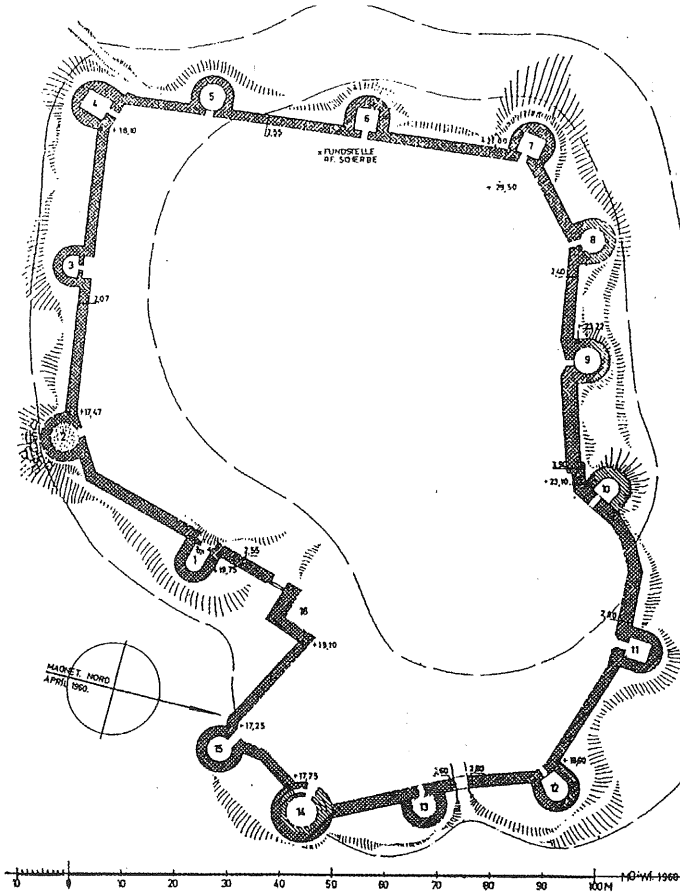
Sketch plan of Kadikalesi (after Müller-Wiener, 1961).
